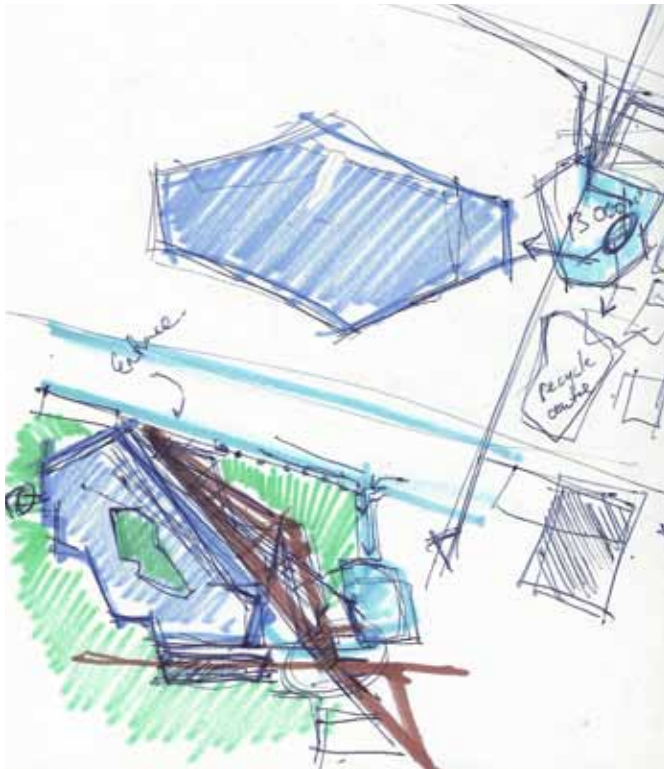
SITE PLAN REVISION 7 (AUTHOR, 2011)
